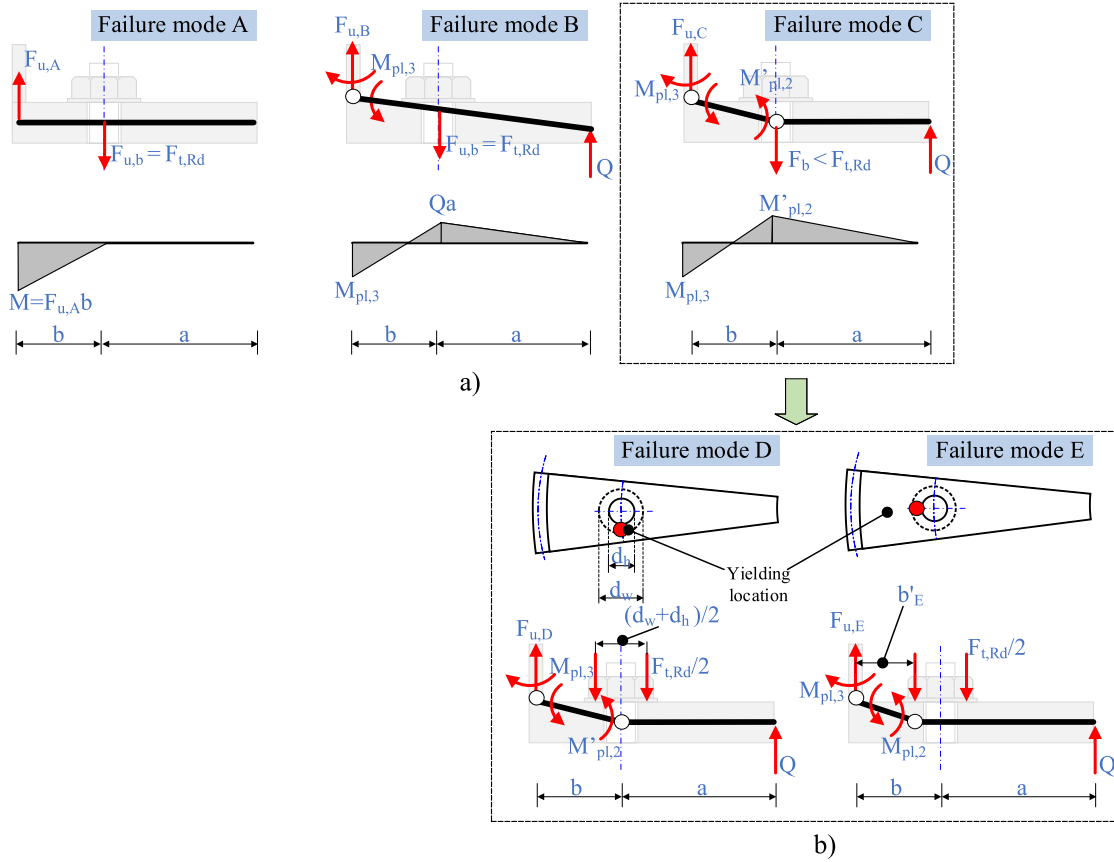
Failure Mechanisms of L-flange joint: (a) according to Petersen [15] and b) Seidel [16].
